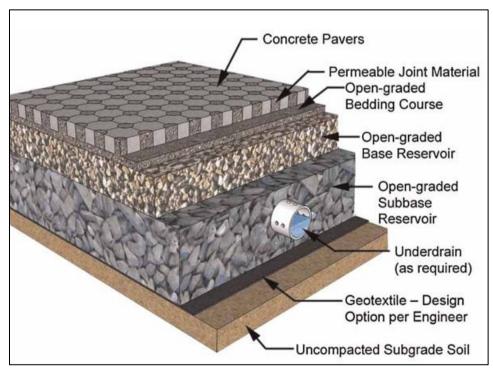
An illustration of a typical Permeable pavement cross-section is shown (photo courtesy of the Interlocking Concrete Pavement Institute) (Drake et al., 2013).
